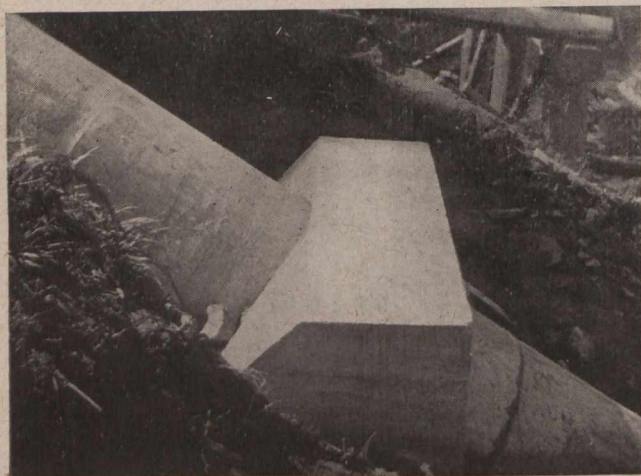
Concrete Anchor in a Syphon Section of the Pipe Line.
